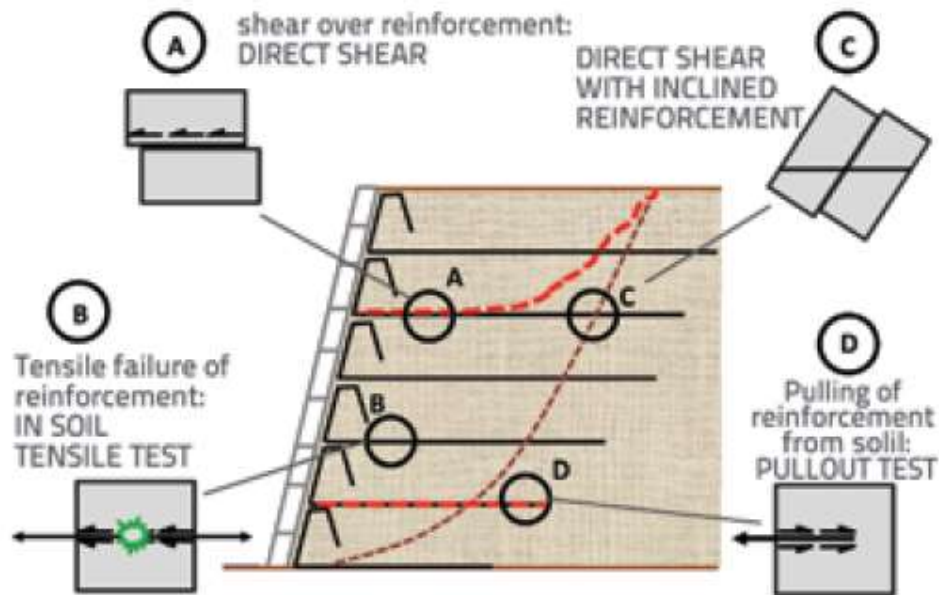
Cross section of embankment of reinforced soil with failure mechanism and tests that correspond to a particular failure mechanism
